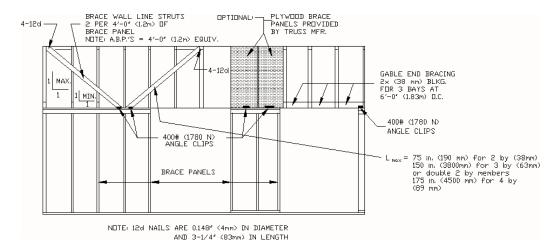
Suggested methods for transferring roof diaphragm load s to braced wall panels.
